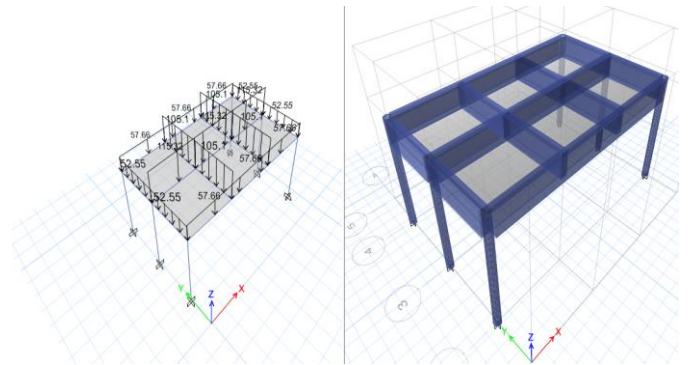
3D view of 3 longitudinal girder T beam and loading
